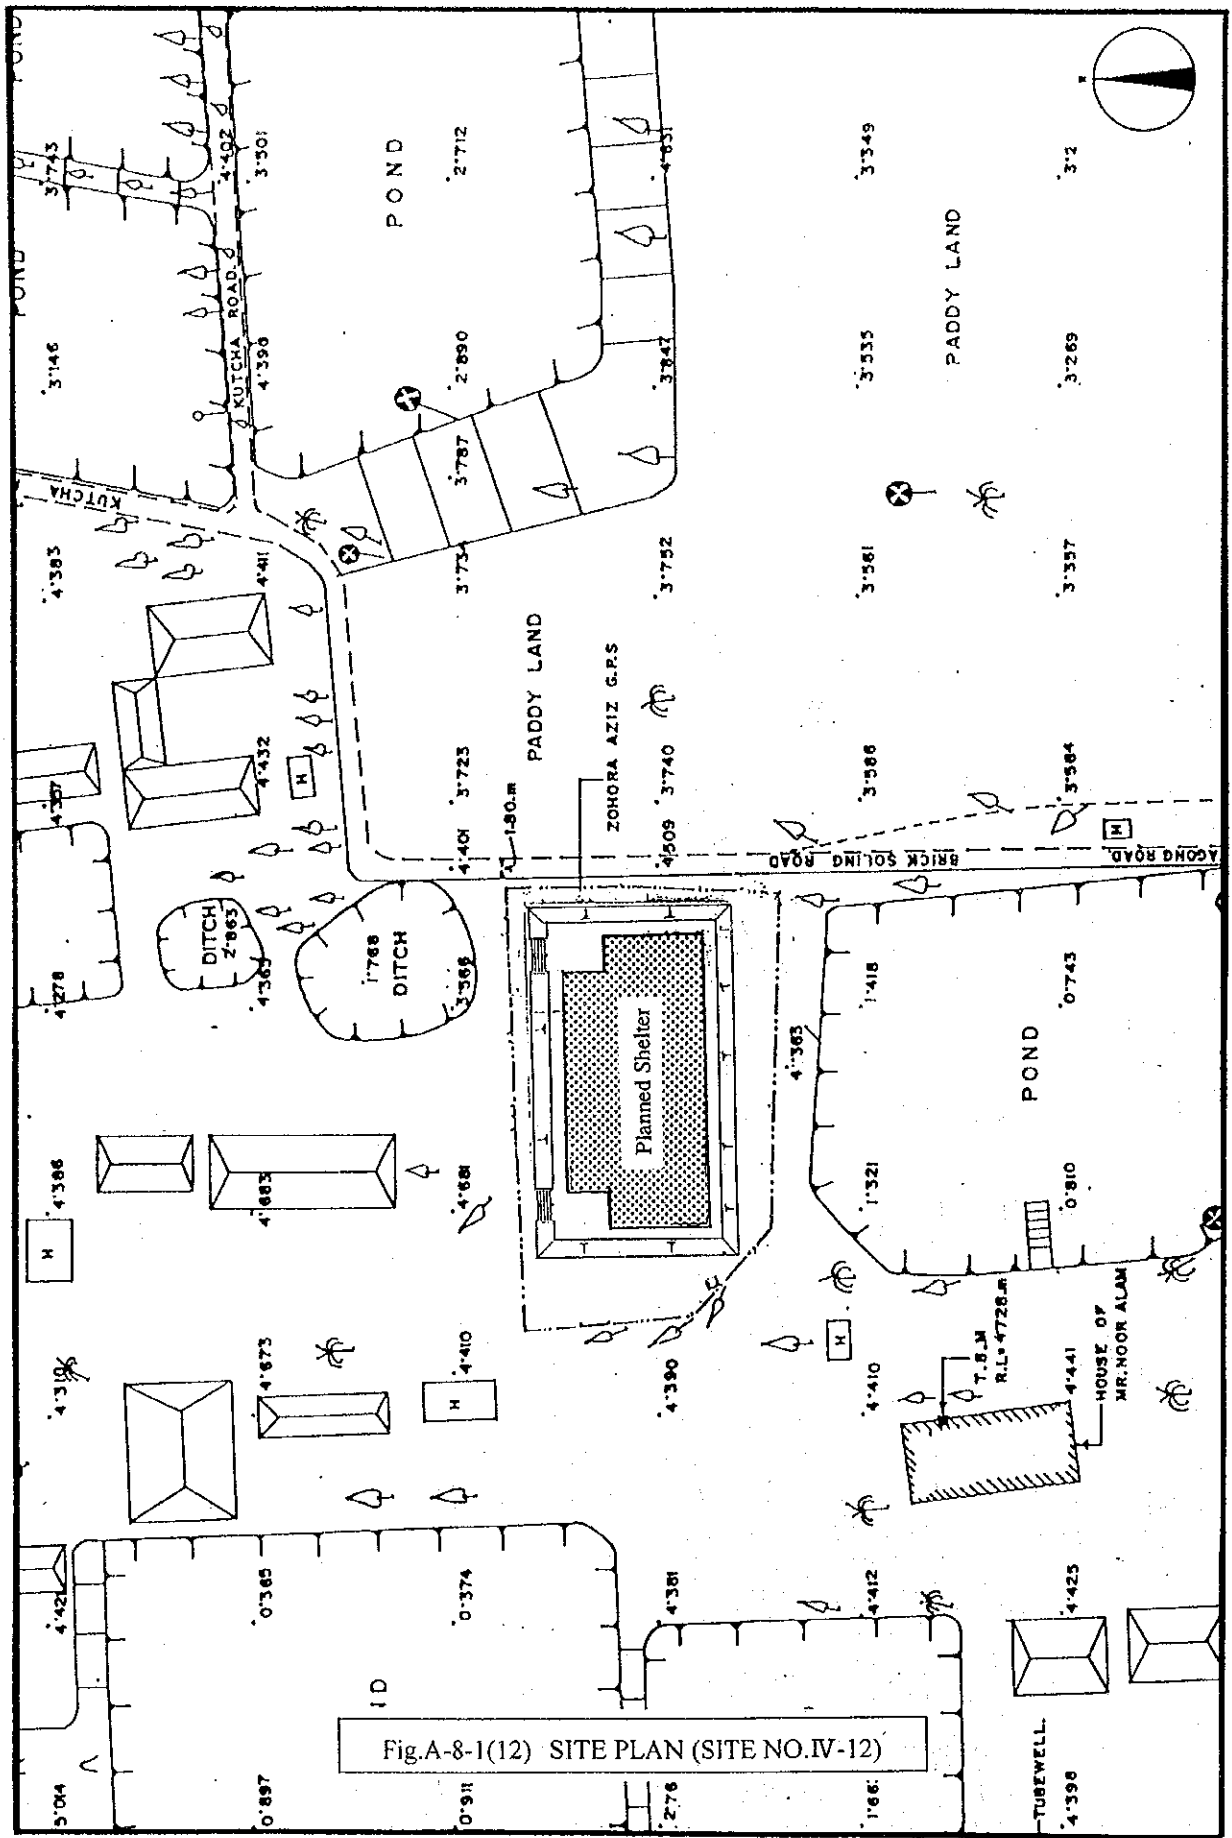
(12) SITE PLAN (SITE NO.IV-12)
